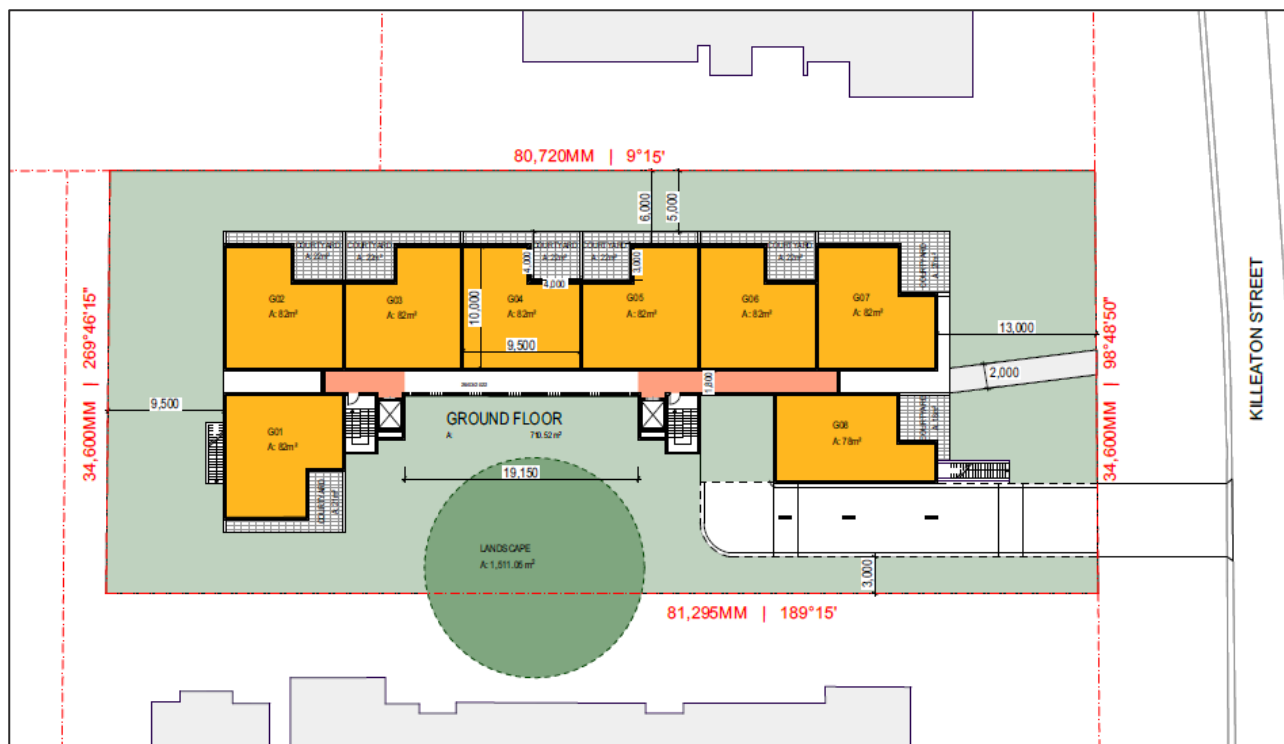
Proposed ground floor plan (Source: mackenzie architects concept architectural plans)
